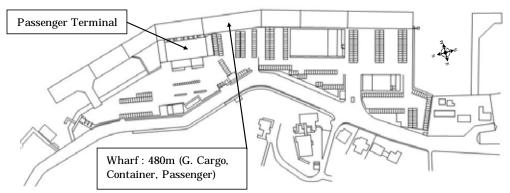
Existing Layout at Balikpapan Port
